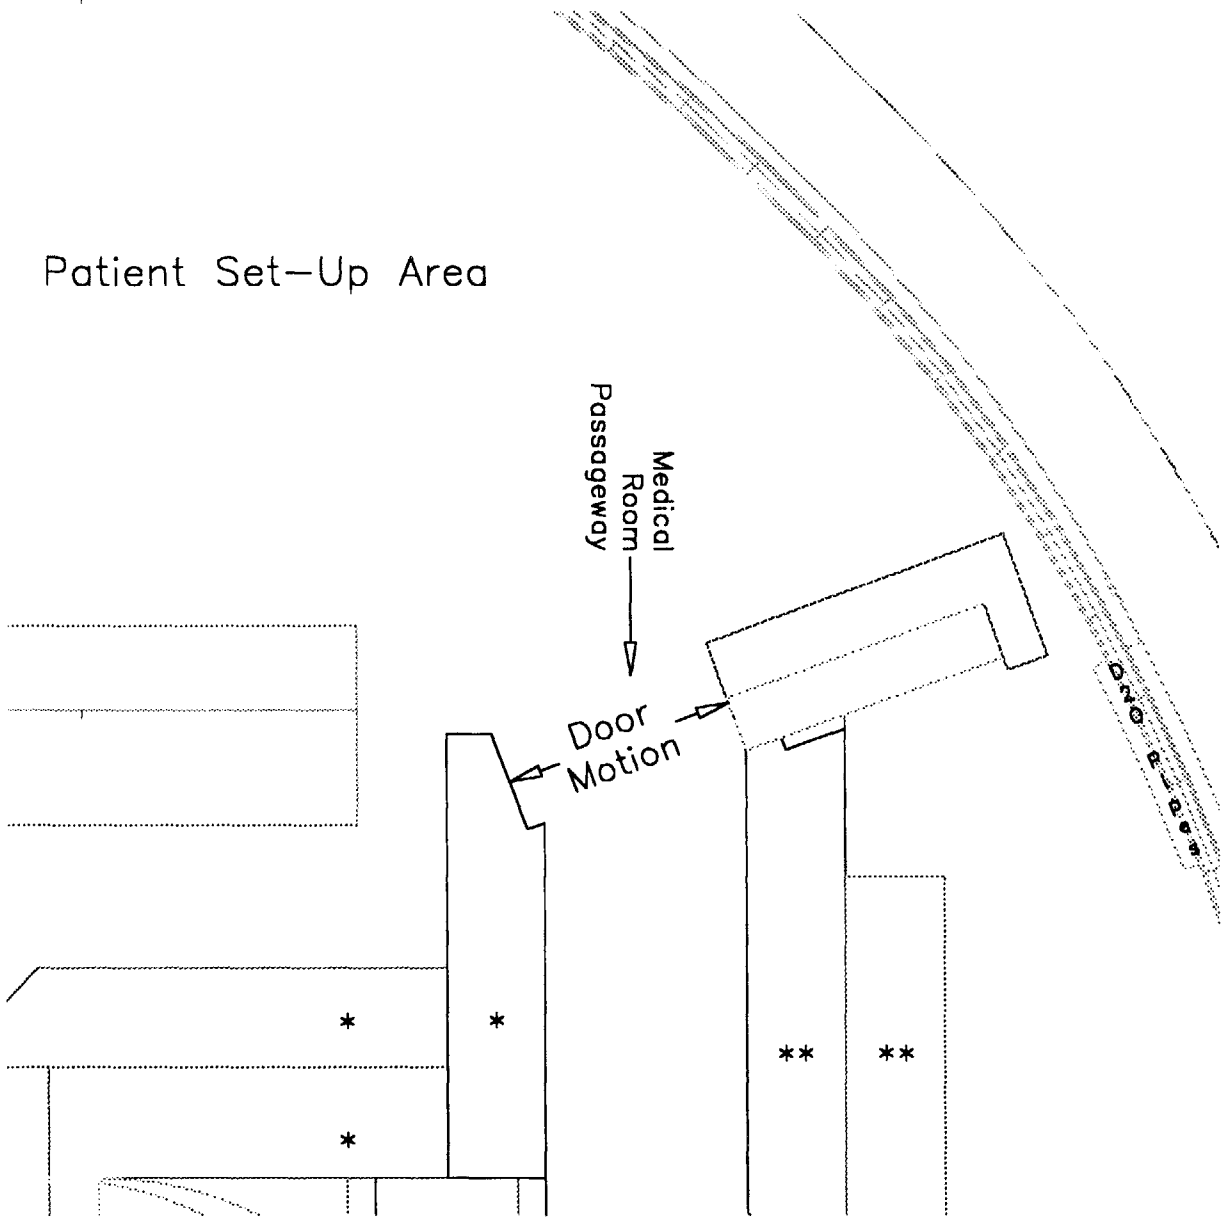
Slanted Sliding Door -- Plan View (support structure for door not shown).
